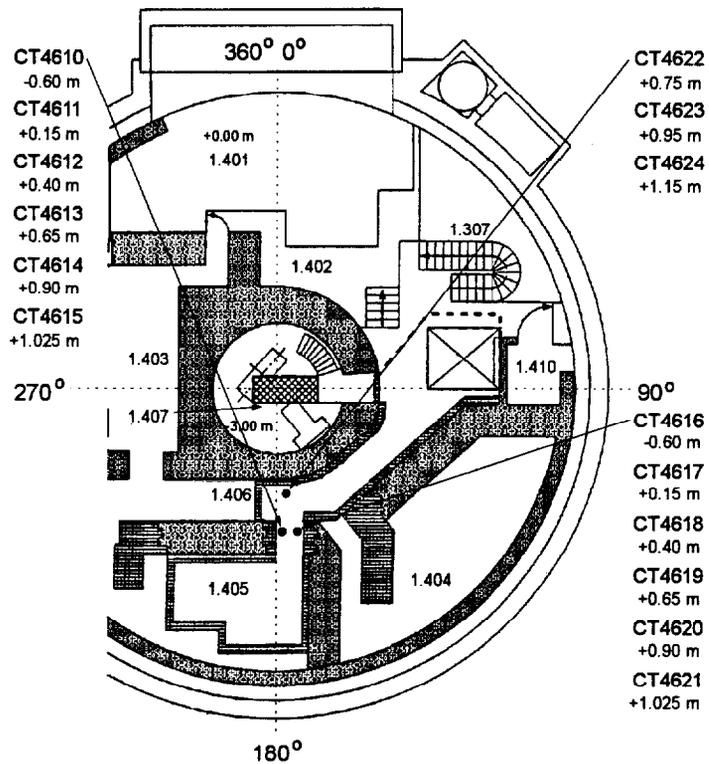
Fire Doorway TC's at the +0.0 m Elevation for T51.2
